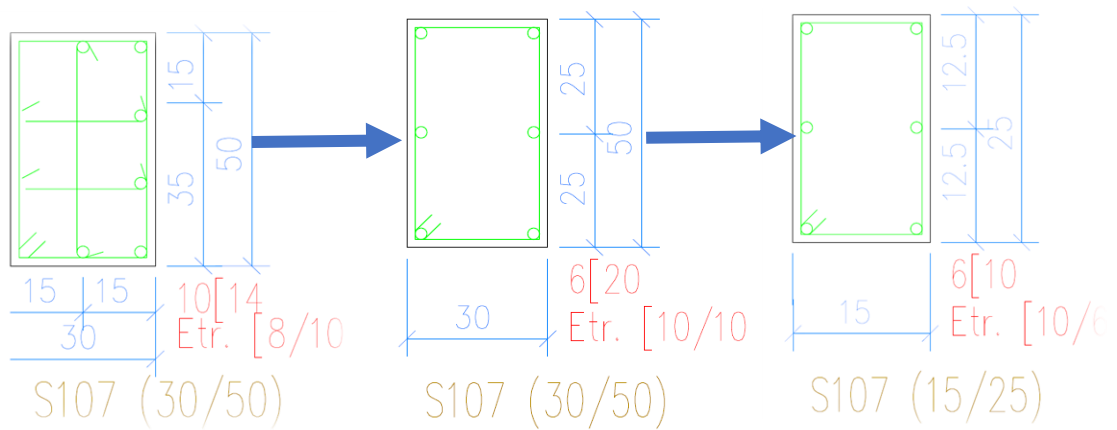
Formwork and reinforcement plan +3.00 elevation
